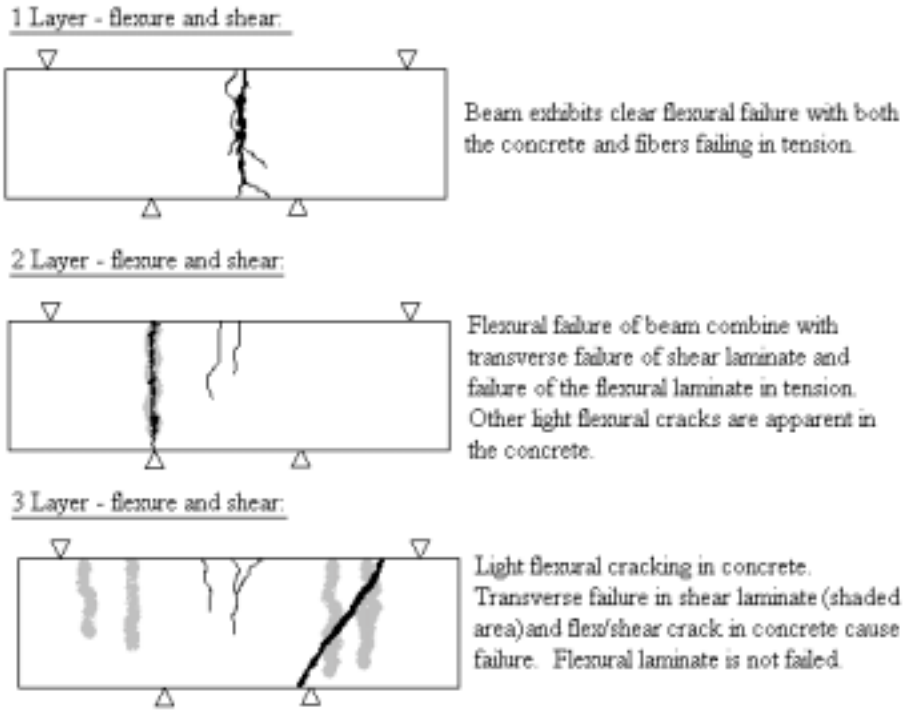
Typical cracking and failure modes for beams strengthened with the MBrace™ glass system for shear and flexure.
